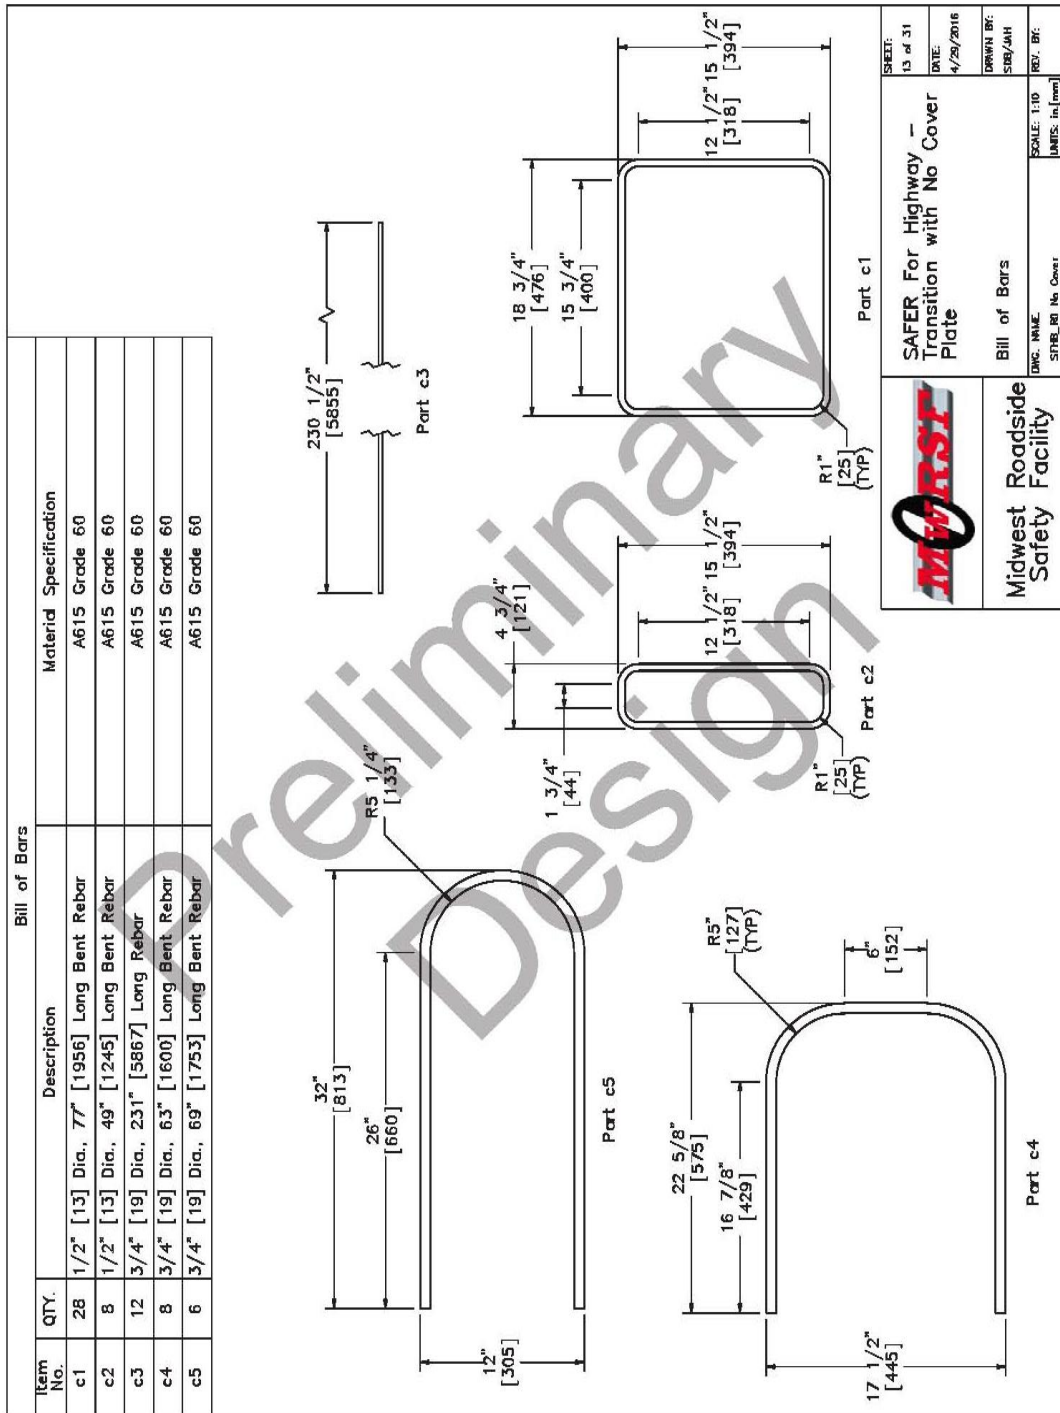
Bill of Bars, No Cover Plate, RESTORE Barrier Transition
